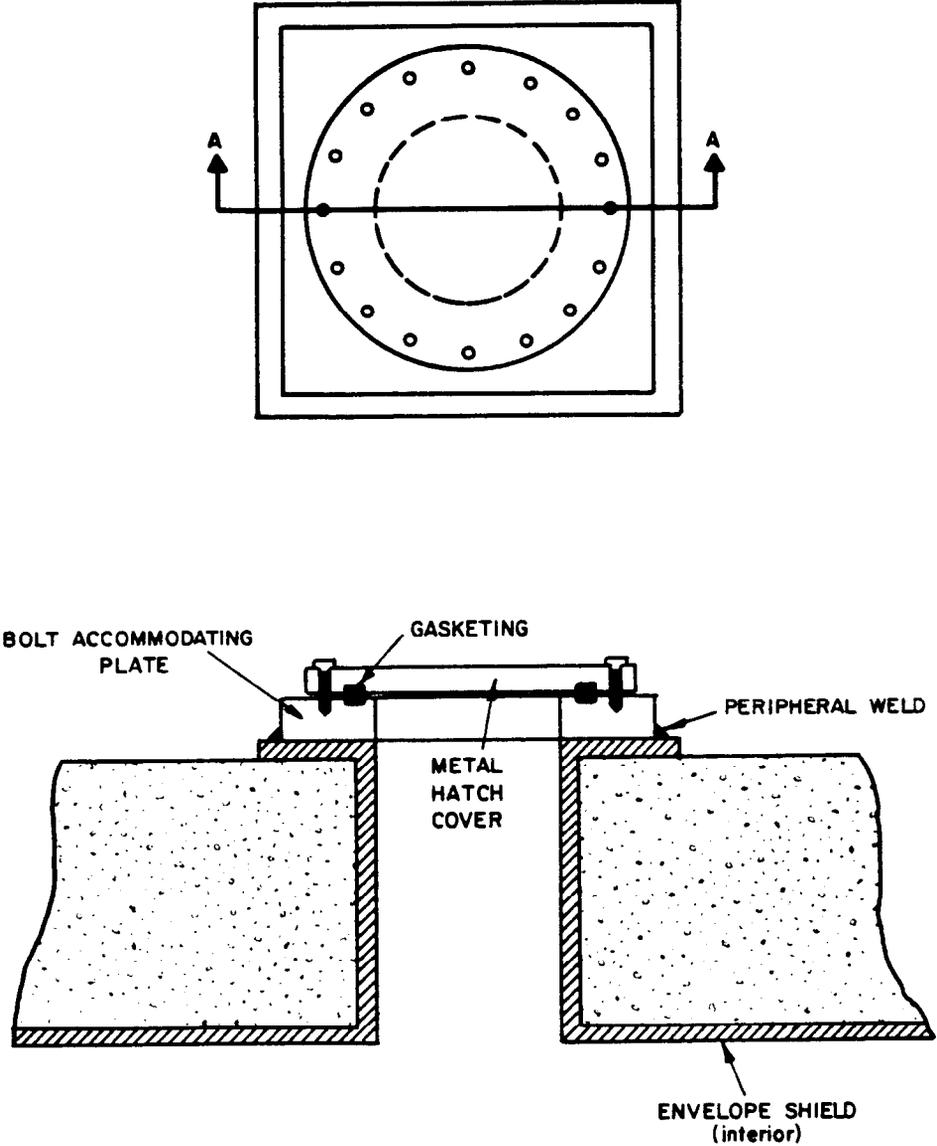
Emergency escape hatch configuration. (Source: ref 5-7)
